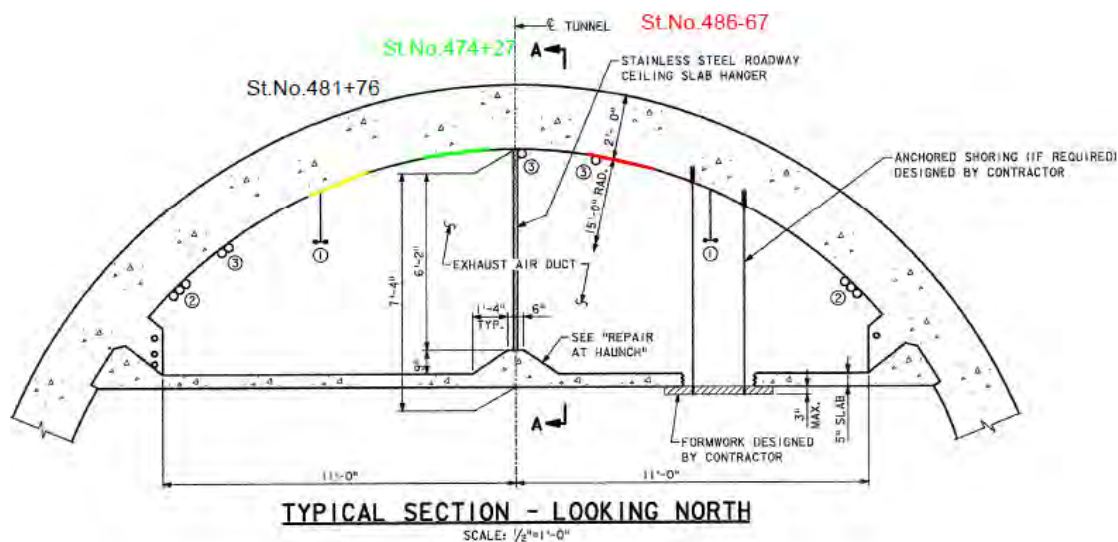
Cross section of exhaust air duct of Chesapeake Channel Tunnel.
